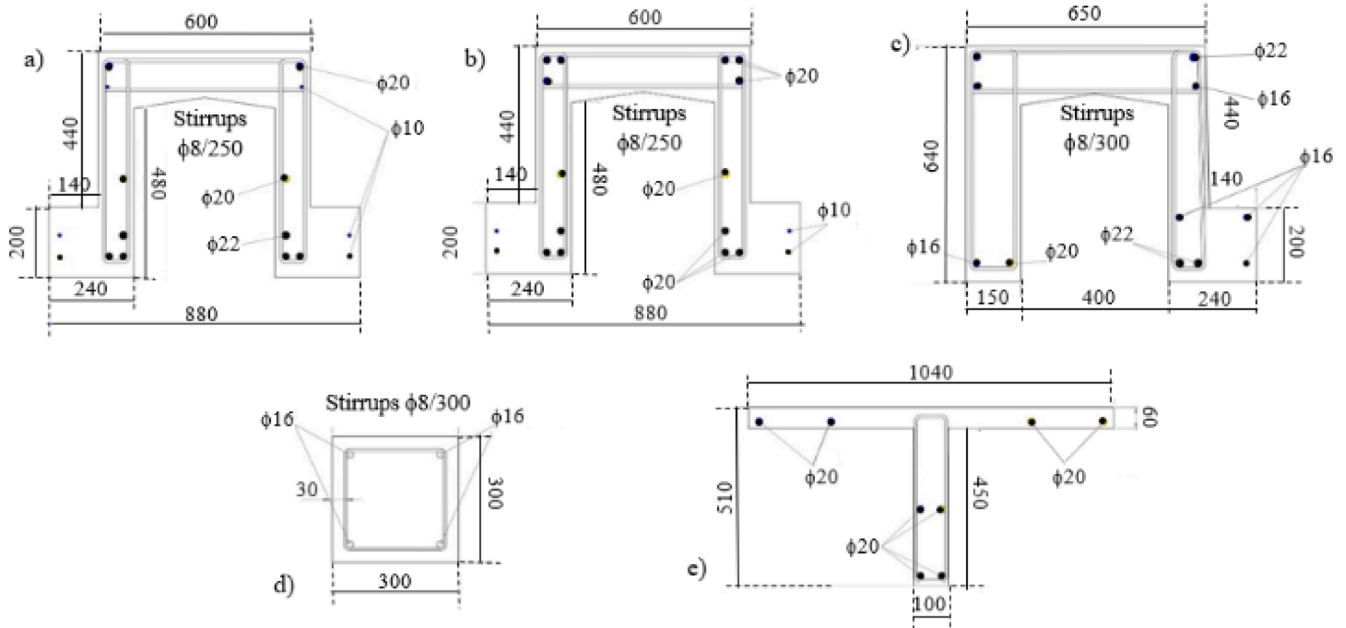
Redrawn cross sections of: a) BA-type beams; b) BB-type beams; c) BC-type beams; d) columns; and e) purlins (dimensions in millimeters).
